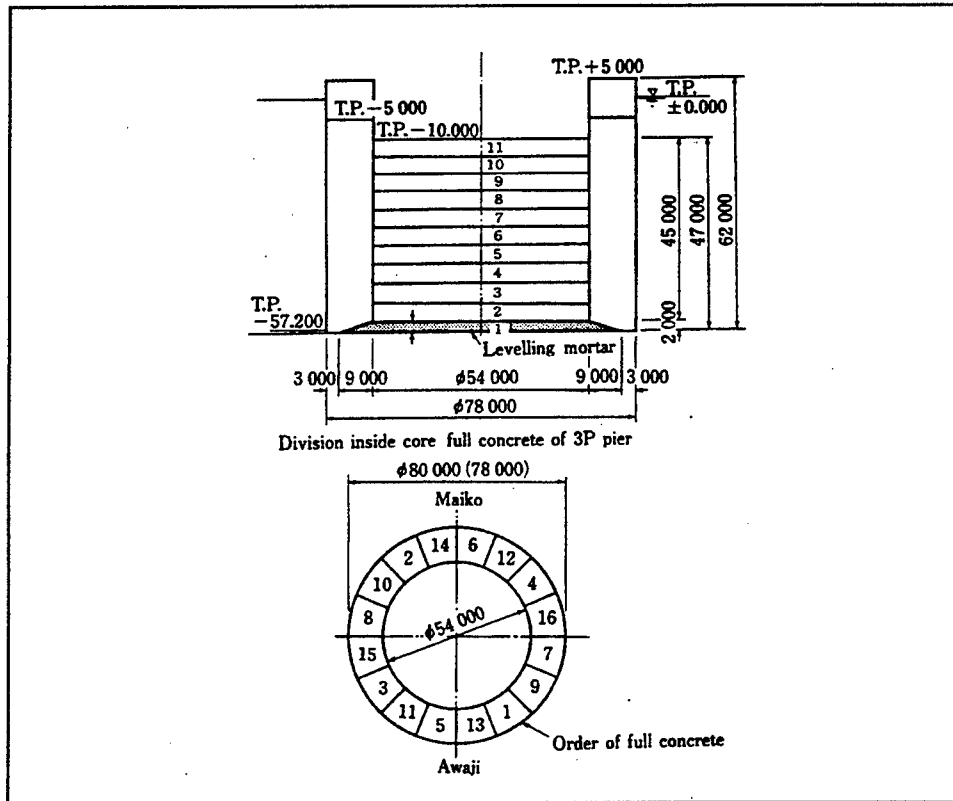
Akashi Kaikyo bridge tower foundation, cross sections
